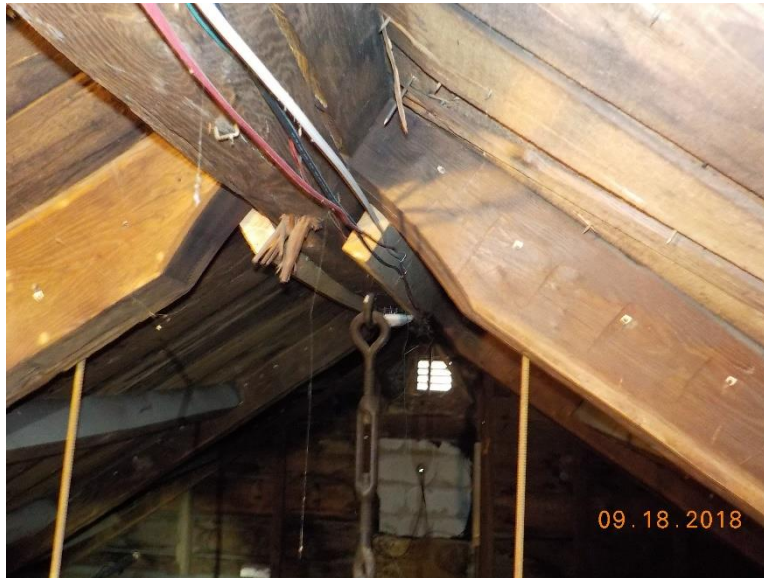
Typical Horizontal Shear Failure of Main Roof Beam at the Bottom of the Mortise Cuts for the Flush Framed Connections With Tenoned Ends of the Roof Purlins
